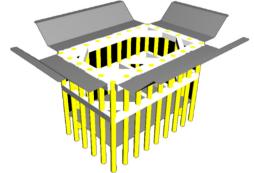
1# bearing platform foundation pit support structure Midas design model.
